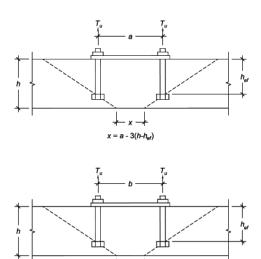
Breakout cone do to tension force near edge in concrete block [6]
